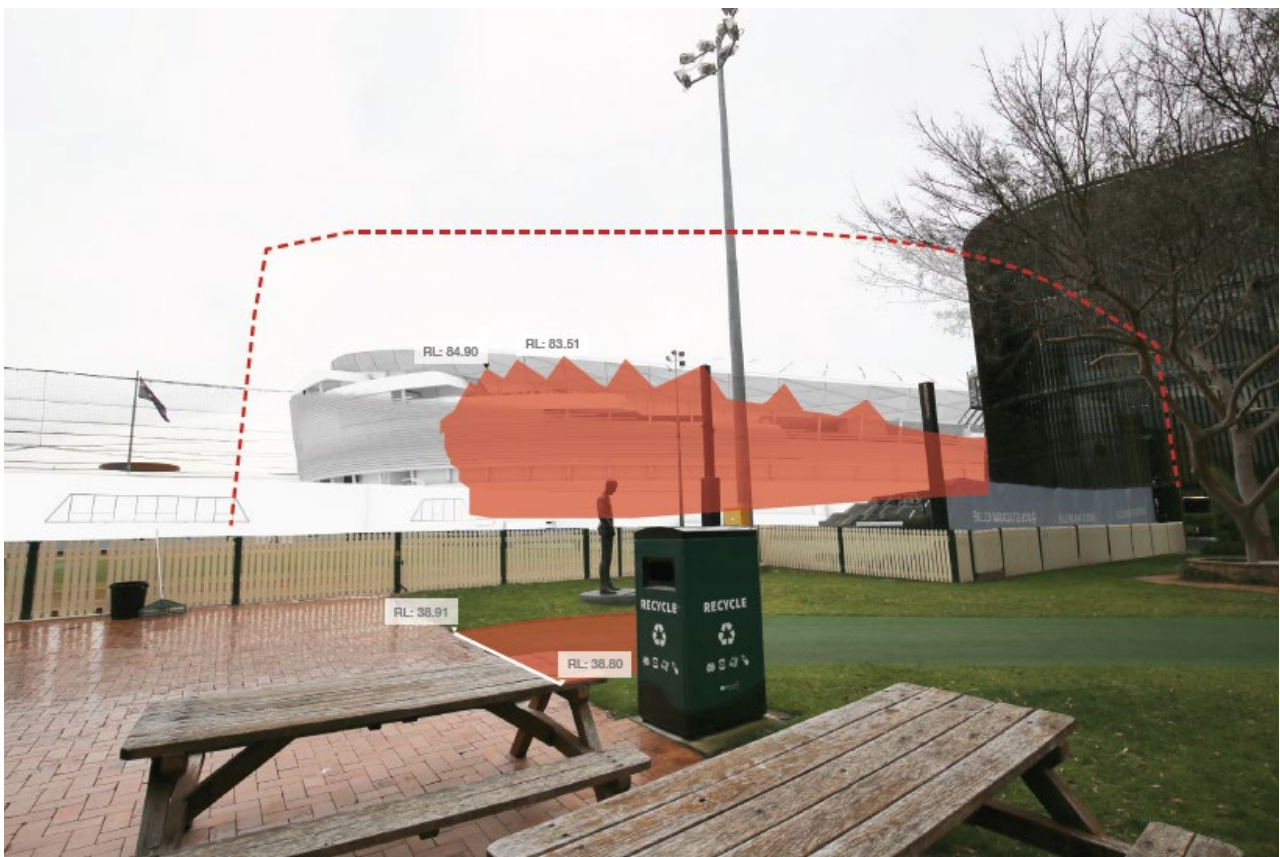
View location 13: SCG Forecourt to North-West of Member's Stand, concept envelope view
